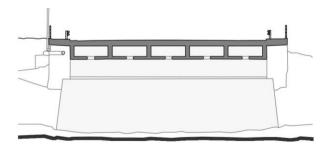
Transverse section of the bridge, as reconstructed by the topographical survey.
